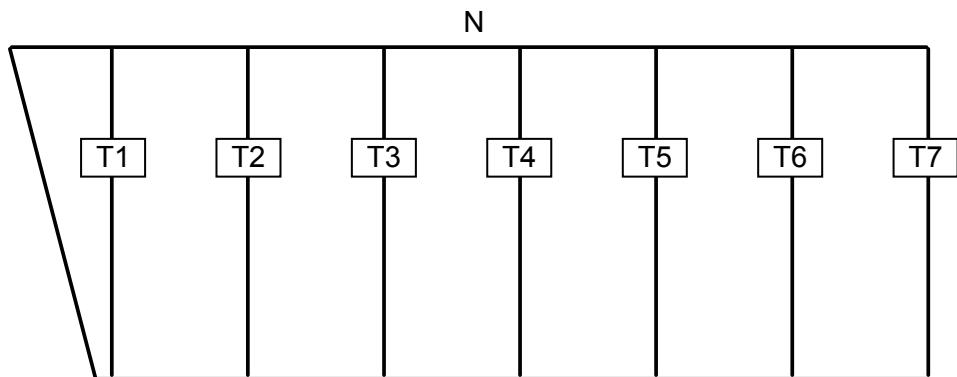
Sketch plan of The Nunnery, Dunster, roof showing the truss numbering scheme used in this report, not to scale
